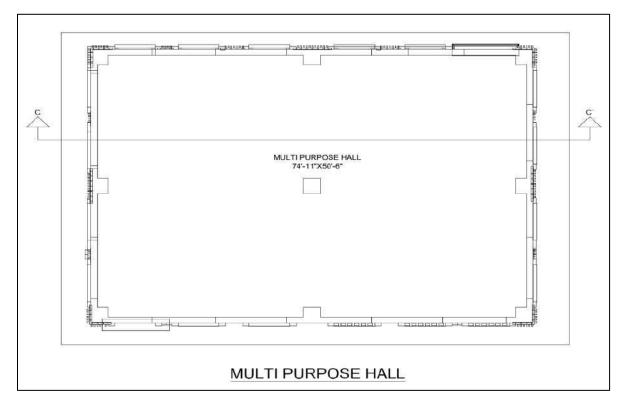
Multi purpose hall section (AutoCad 2022)
